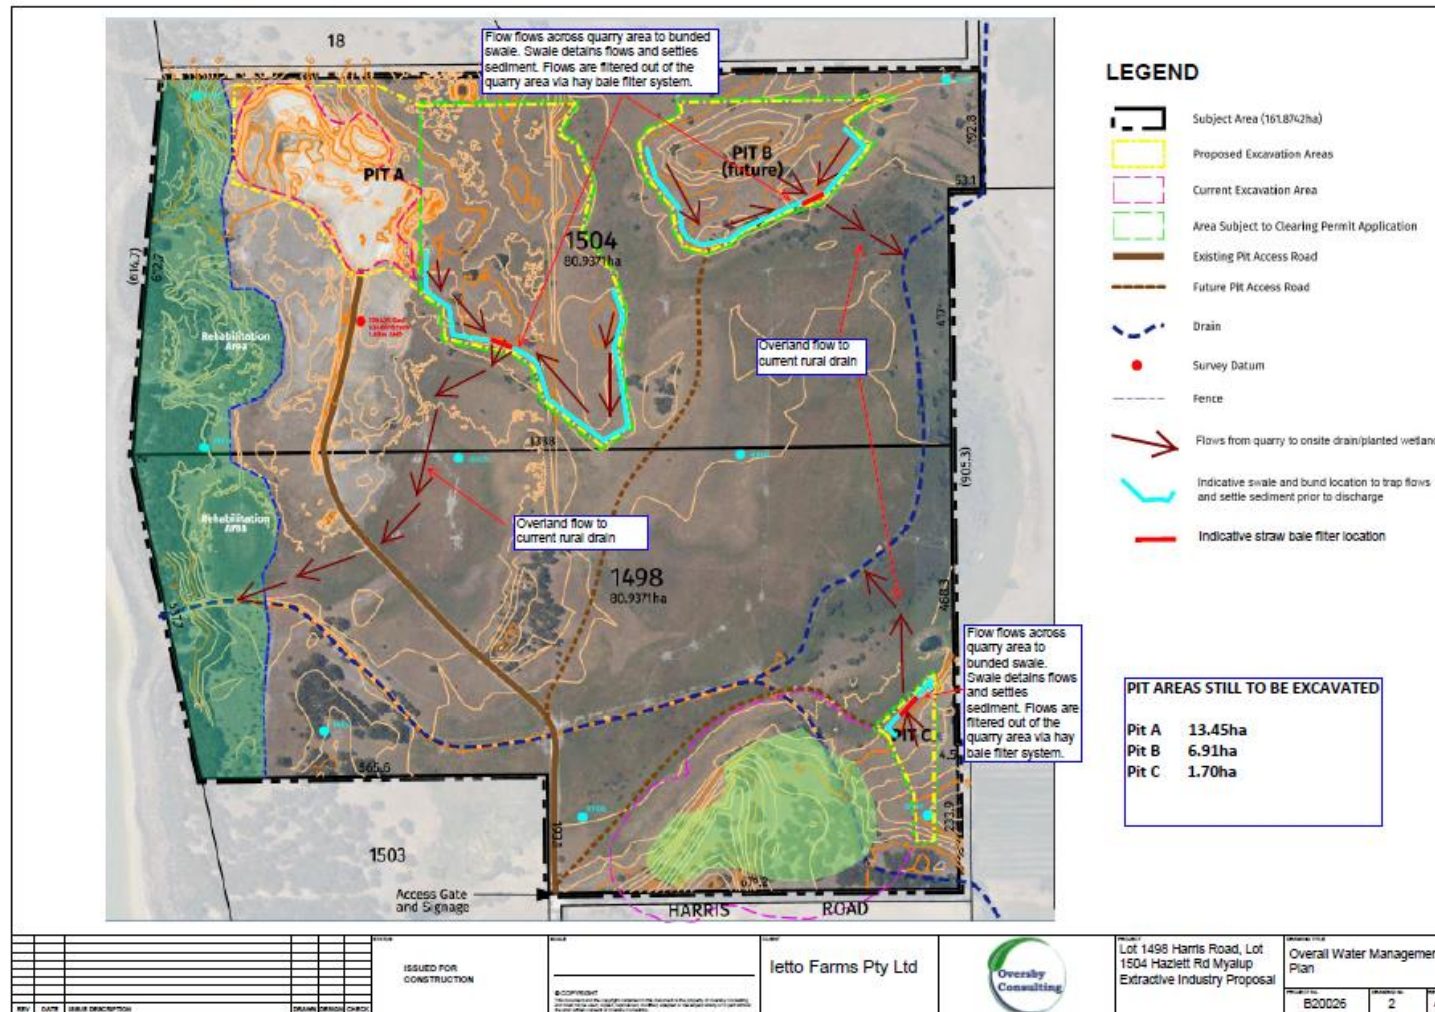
Map showing swale, bund and straw bale filter locations to be construction around each excavation pit
